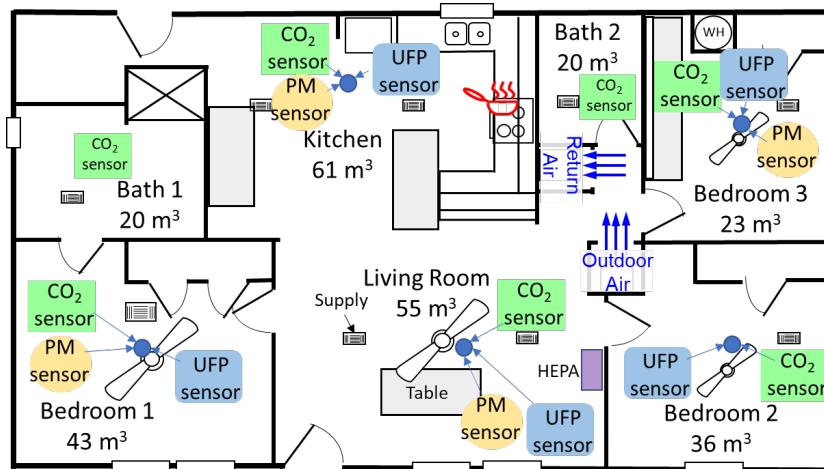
UTest House Floor Plan with Test Equipment Layout.
